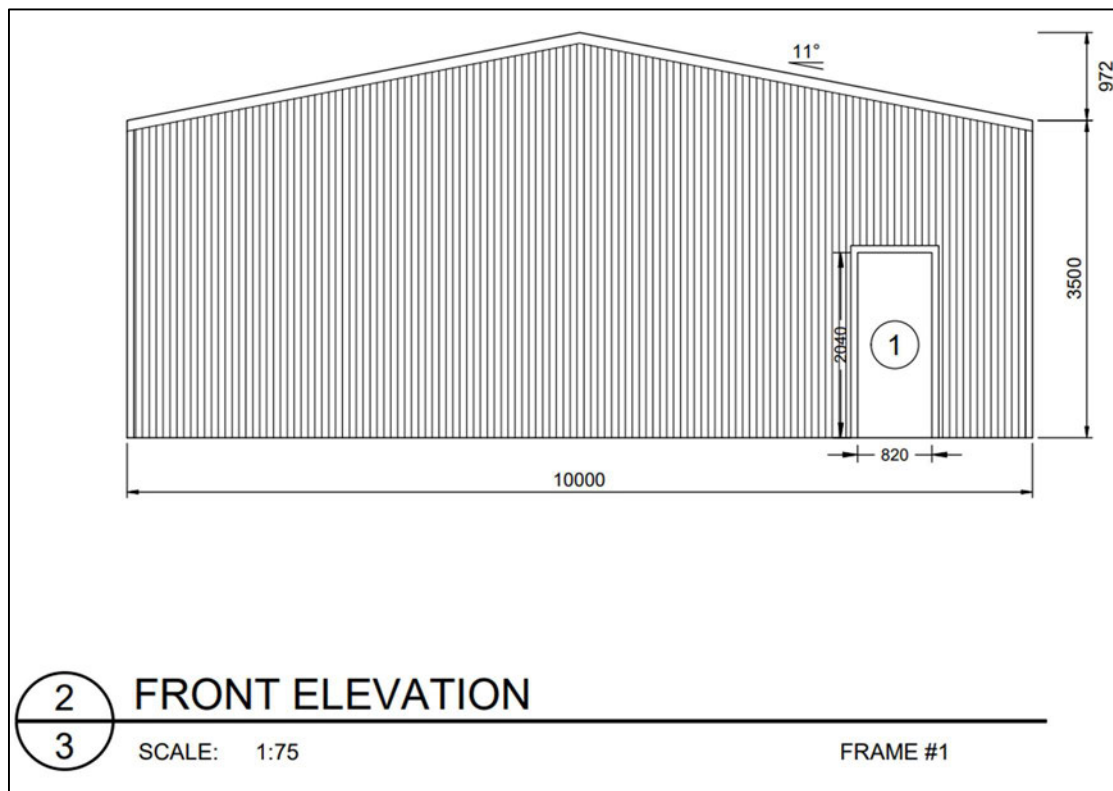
Front Elevation Prepared by Emerald Design and Construction (Appendix 2)
